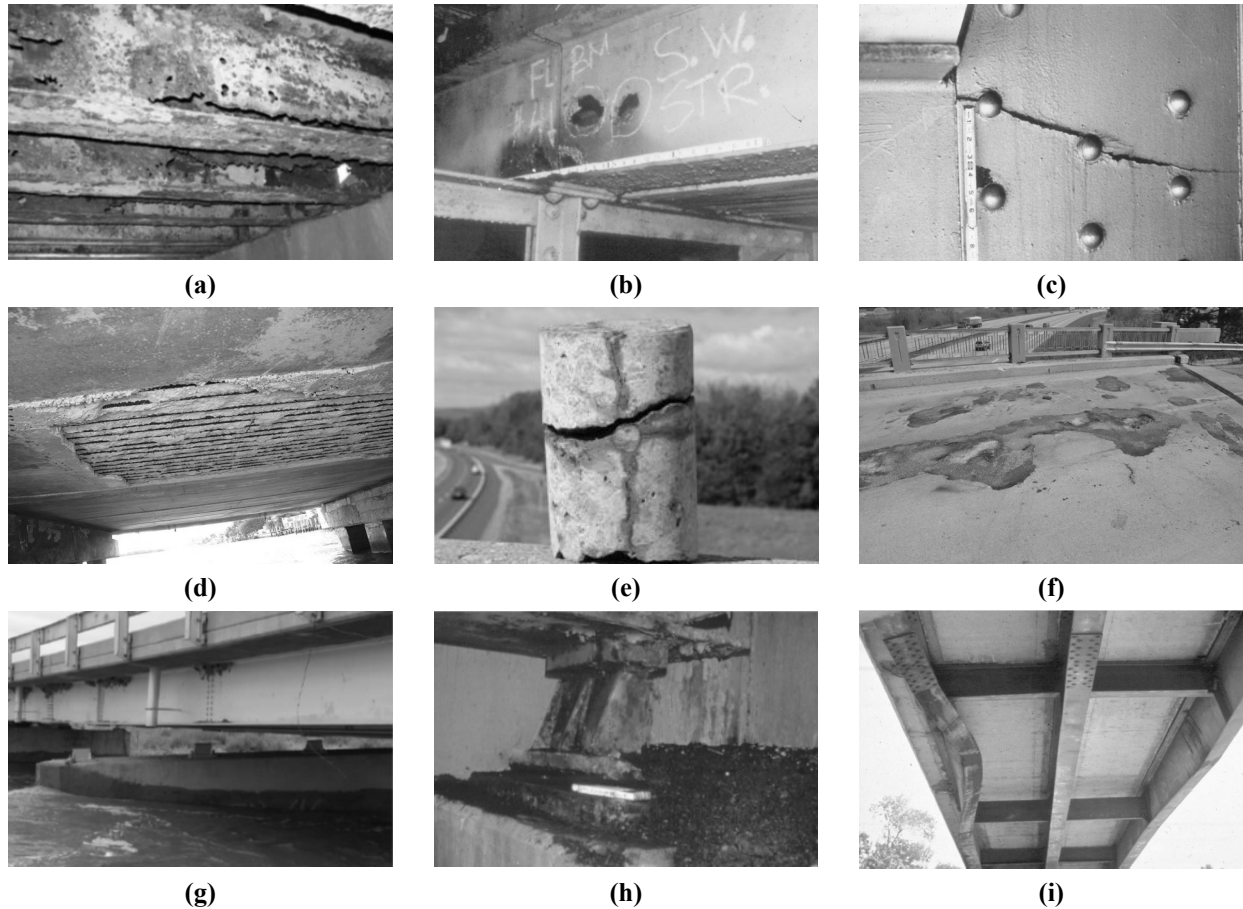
Commonly recognized damage mechanism in steel girder bridges: (a) steel corrosion, (b) section loss, (c) fatigue cracks, (d) rebar corrosion, (e) delamination, (f) spalling, (g) bridge settlement, (h) frozen bearing, (i) lateral impact
